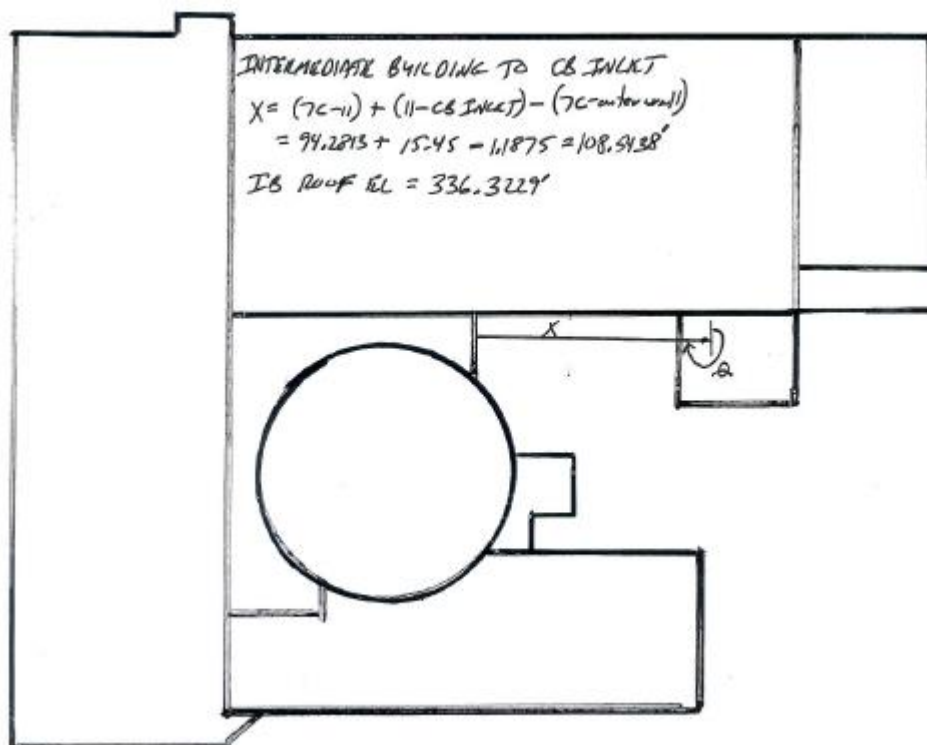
Intermediate Building (Point Source) to Control Room Inlet
